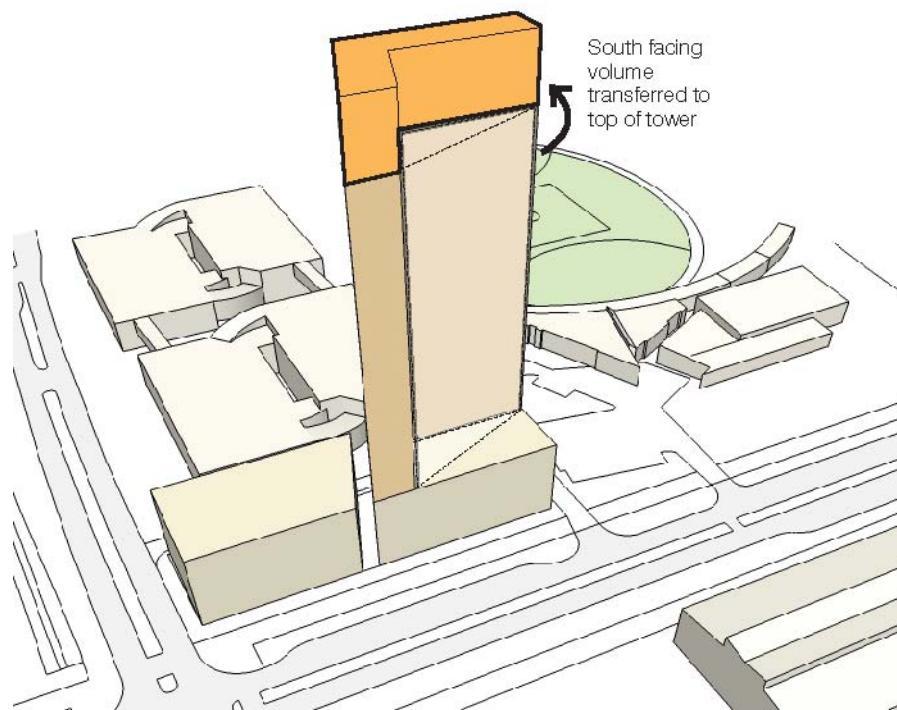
Illustration of building bulk shifted from southern elevation to the top of the building, ensuring all apartments enjoy excellent amenity
